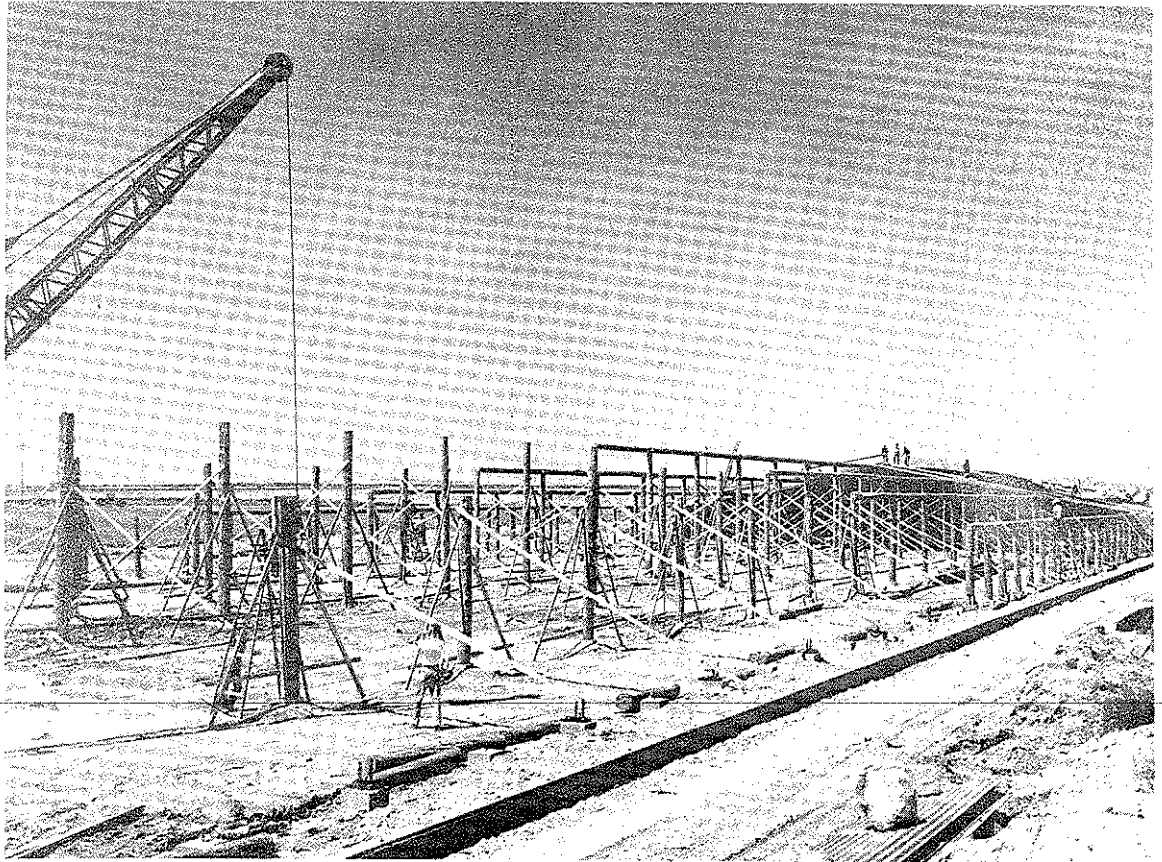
Construction view of Fig. 2. Courtesy of U. P. Railroad.
